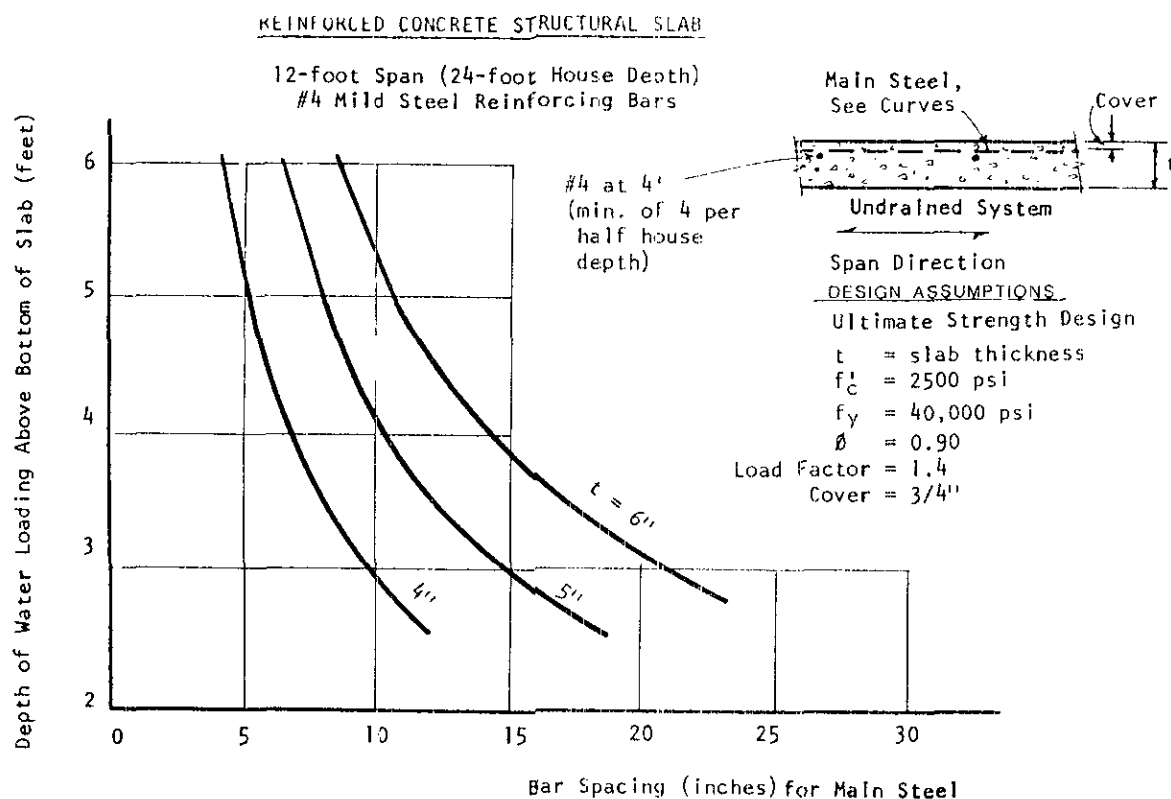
Slab reinforcement design, #4 steel reinforcing bars, 12 foot span. (Reference 26).
